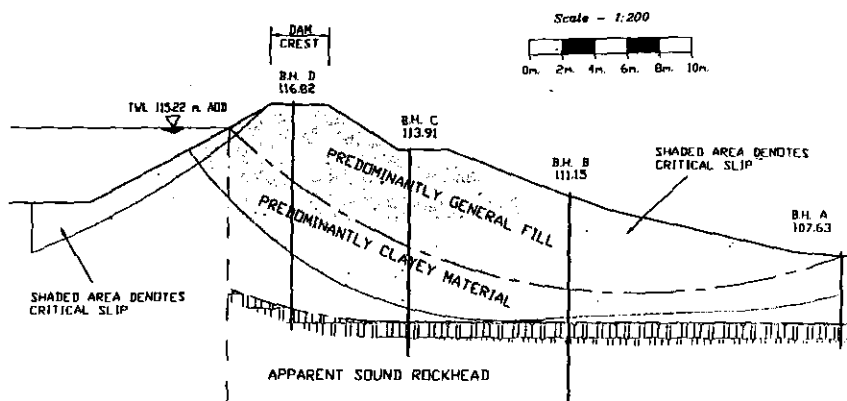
Cross-section through deepest section showing potential slip surfaces
